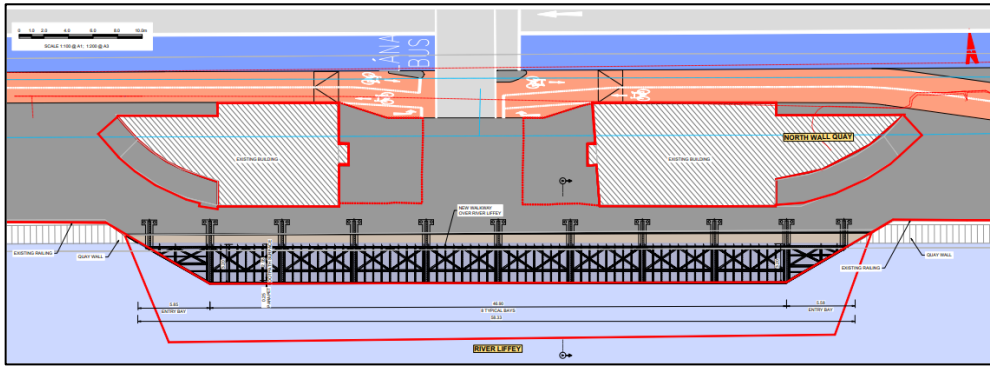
Plan view of proposed boardwalk structure at Area C.
